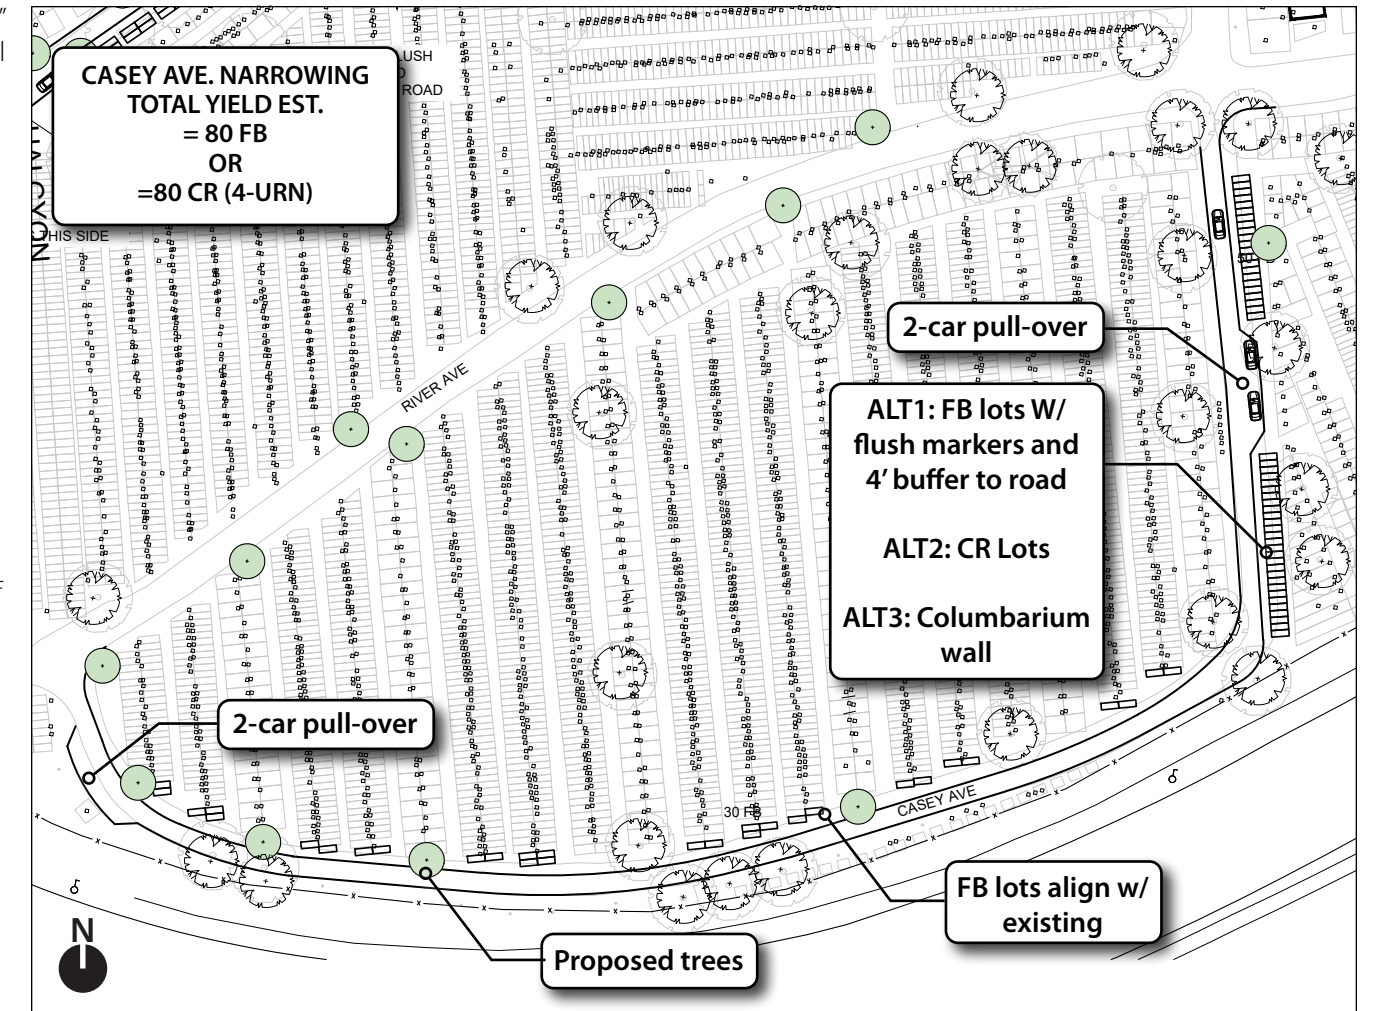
Conceptual plan study for Casey Avenue narrowing including proposed lot layout and new trees.
